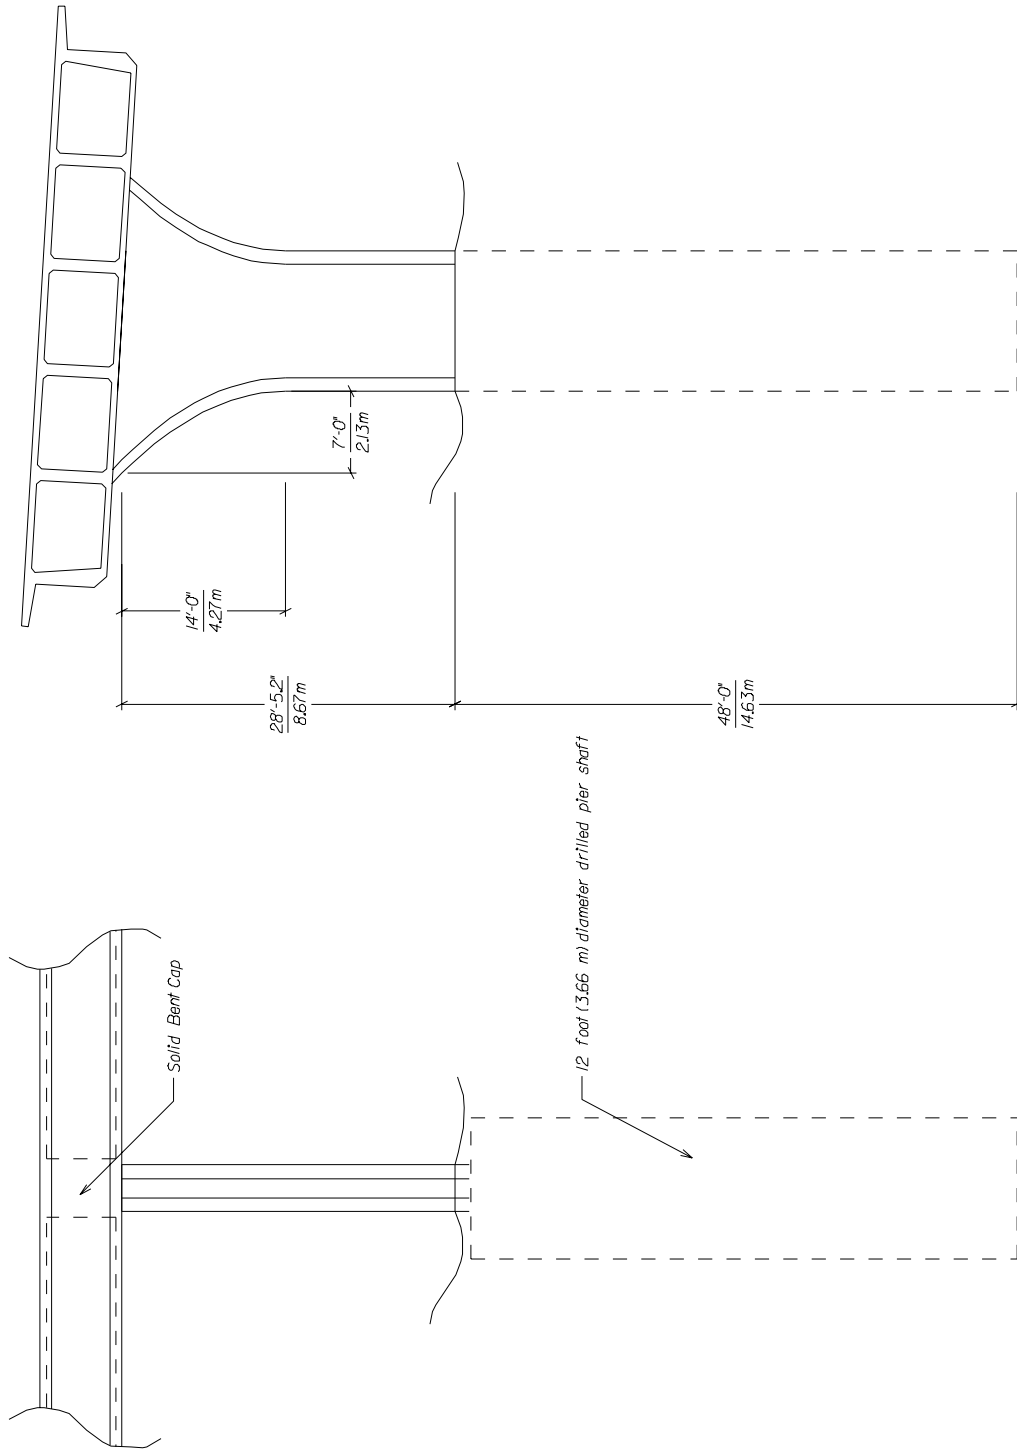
General Elevation and Plan for Route 14/Interstate 5 Separation and Overhead Bridge
